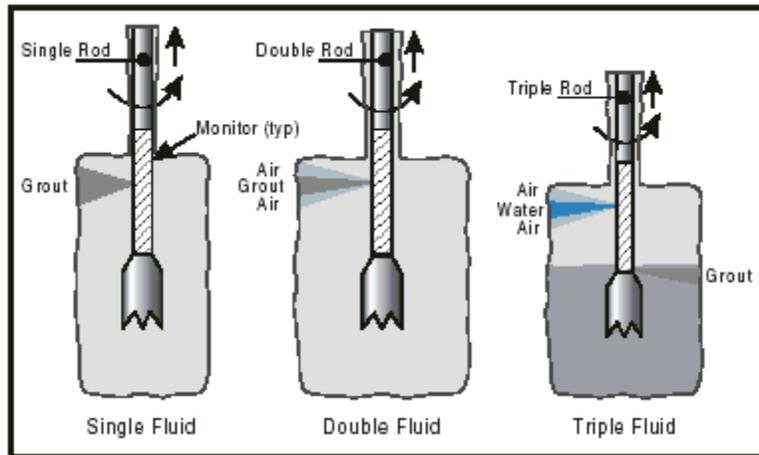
Jet Grouting Systems (from Hayward Baker)
